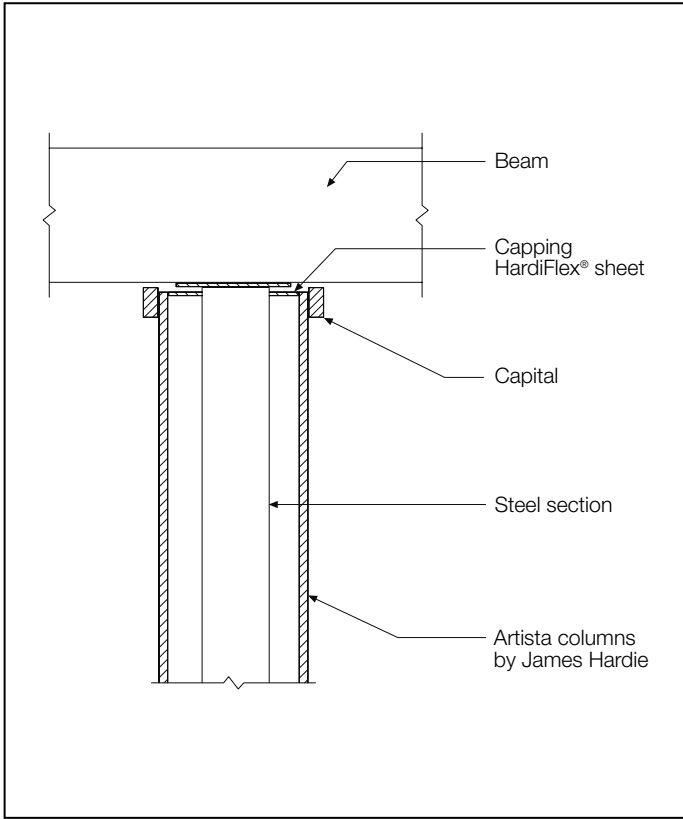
ALTERNATIVE STEEL POST FIXING DETAIL
